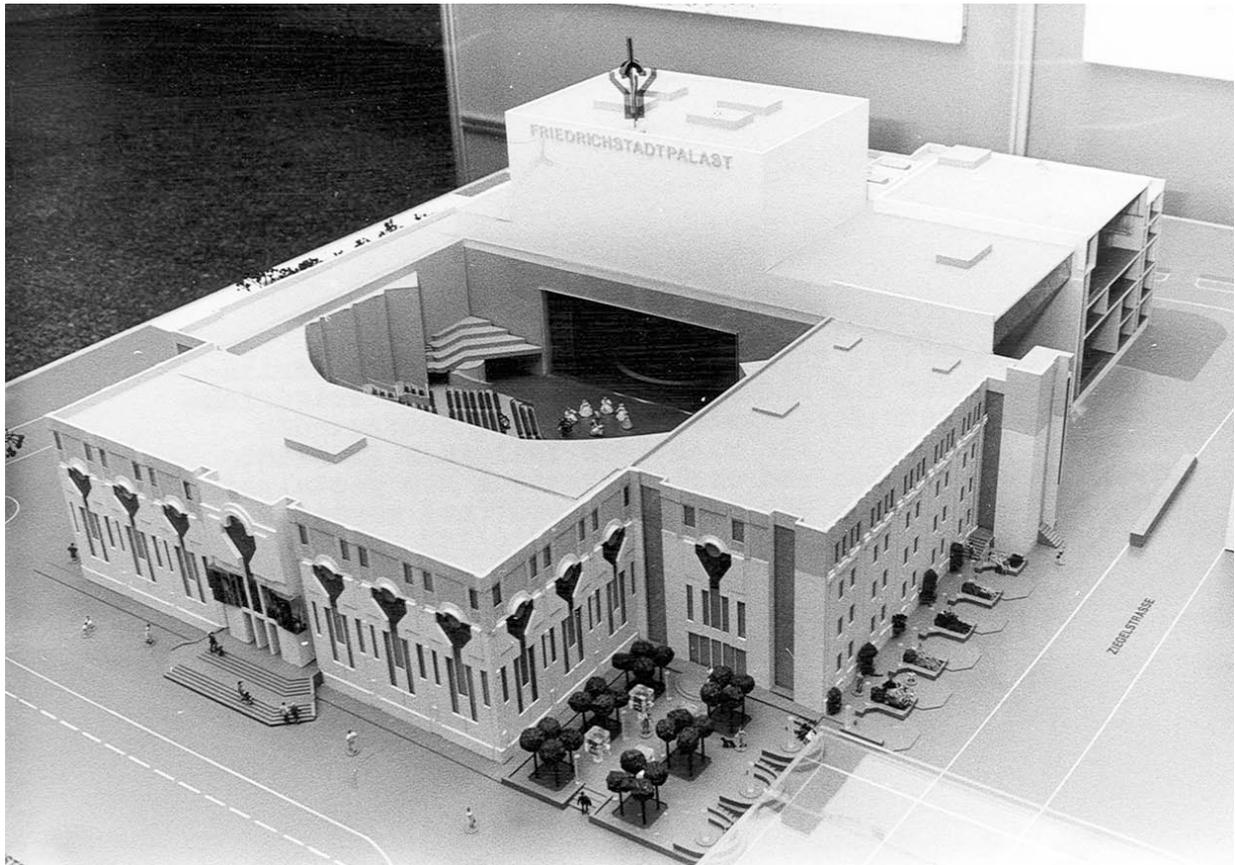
Friedrichstadt Palace, model of Prasser's first façade design with "raised arms" (1981)
